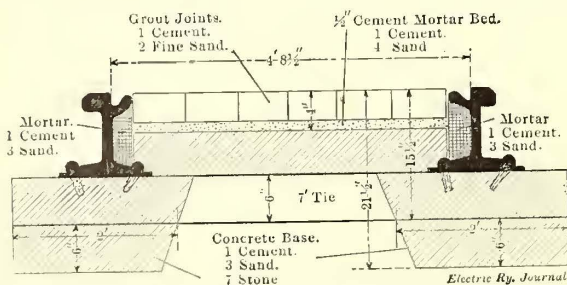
Boston Elevated Railway—Concrete Beam Construction for Heavy Traffic
